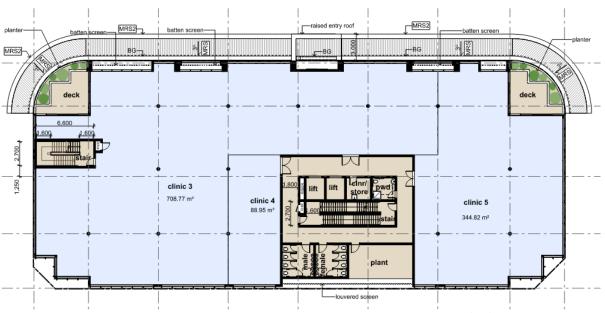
First Floor Level Floor Plan. Source: Sparc - Issue N dated 05/03/24
